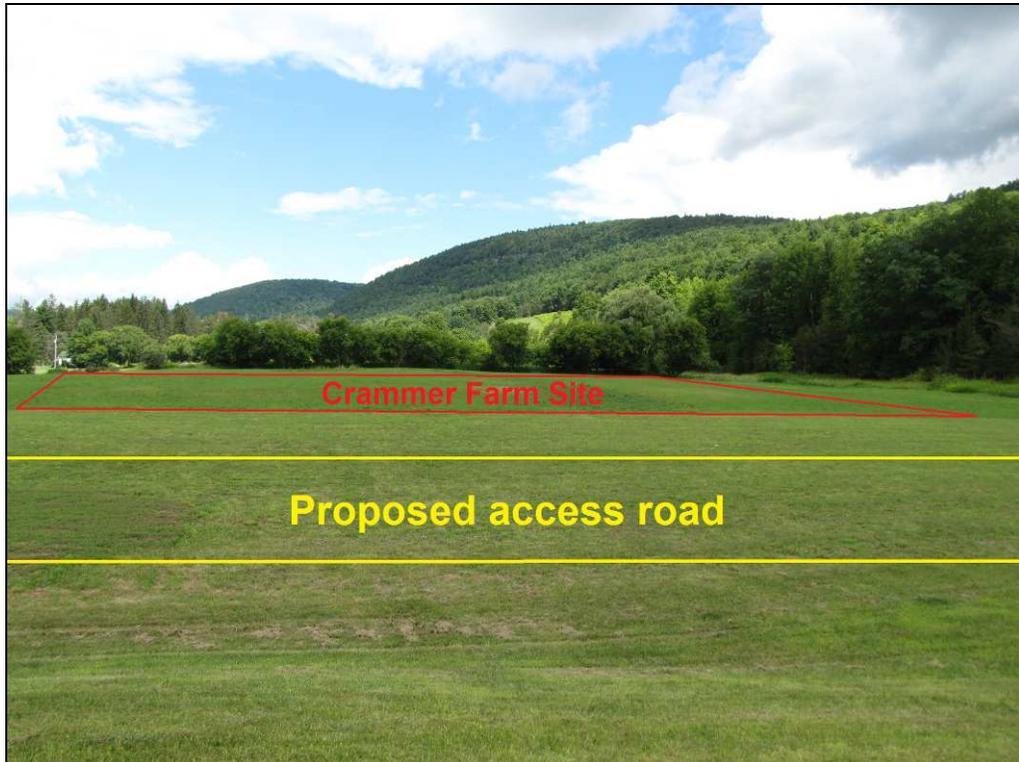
View north across proposed secondary access road alignment toward Cammer Farm Site.
